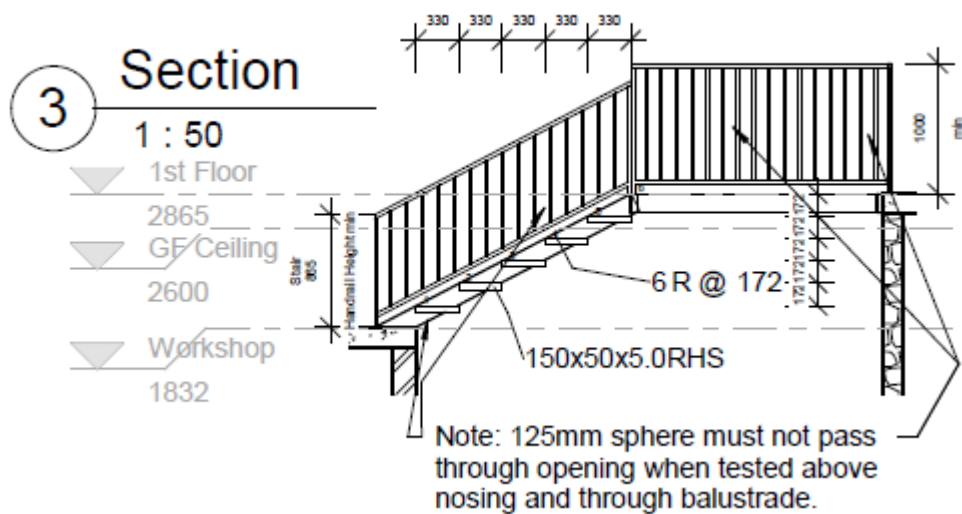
| A section view of the proposed stairs (Source: Applicant's documentation)
